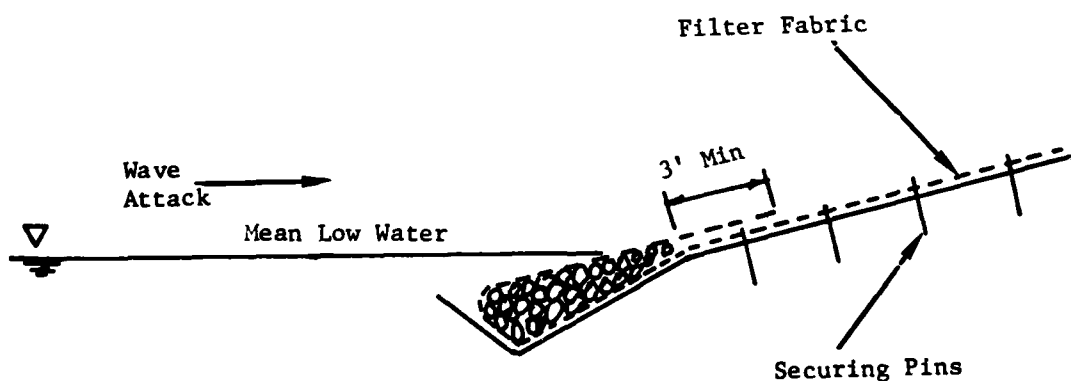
Key trench design used when soil conditions do not permit construction of vertical walls
